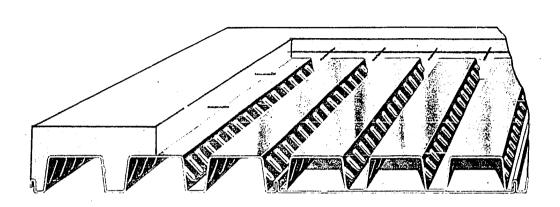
Example of CATEGORY I - Steel deck utilizing embossments on webs of deck (Courtesy of the Inland-Ryerson Steel Company)
